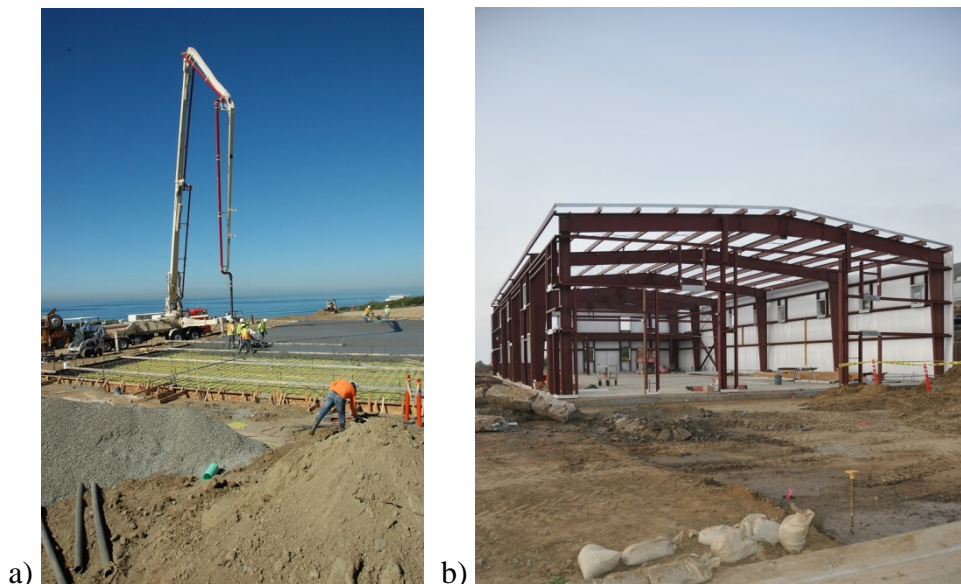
a) The main slab for Building 585 was poured on 28 January 2016 at the Central Test Site, just north of Woodward Loop across from Building 594. b) Building 585 construction looking north on 29 February 2016.
